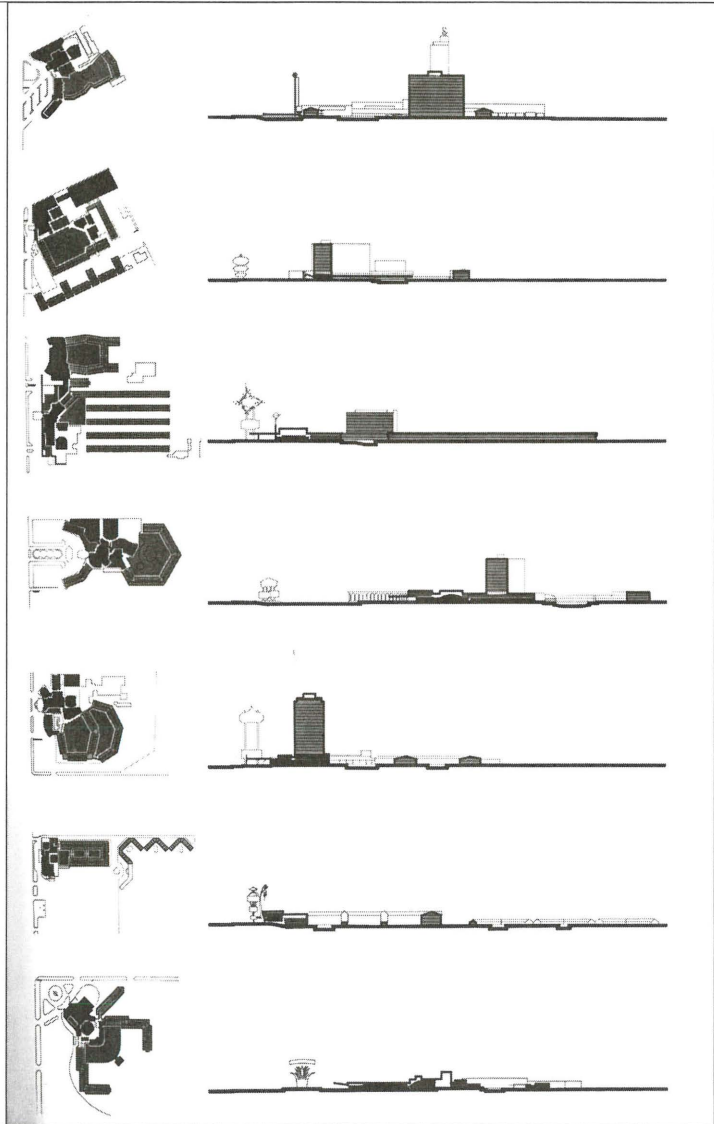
| *A Schedule of Las Vegas Strip Hotels: Plans, Sections, Elevations
